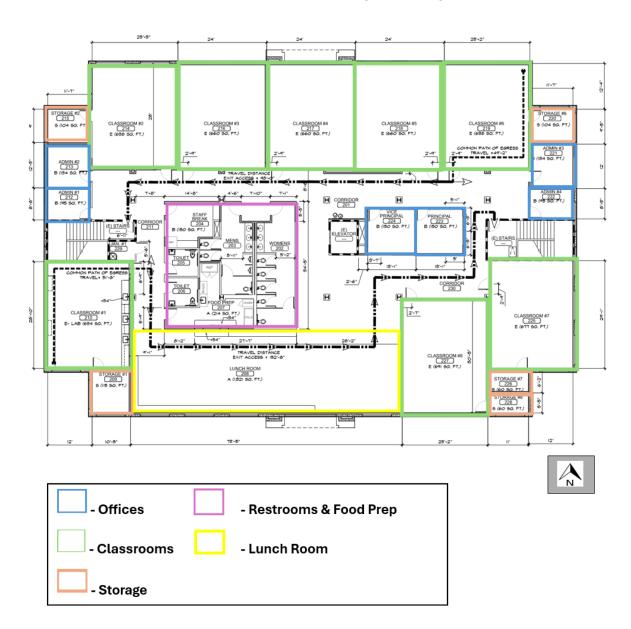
Exhibit C: FLOOR PLAN (1<sup>ST</sup> FLOOR)
